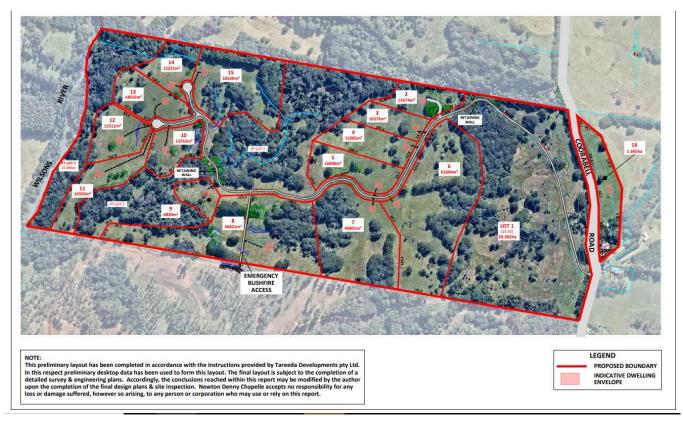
Proposed Community Title Subdivision Neighbourhood Lot Plan 3
